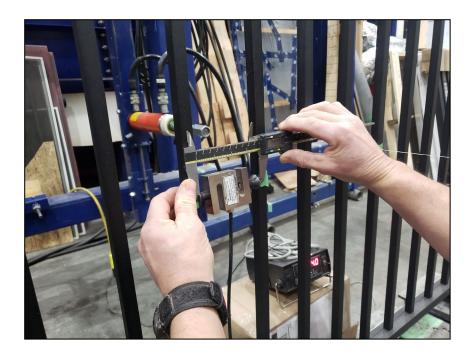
2015 NBC, Section 4.1.5.14, Clause (4): Size of Opening Test
